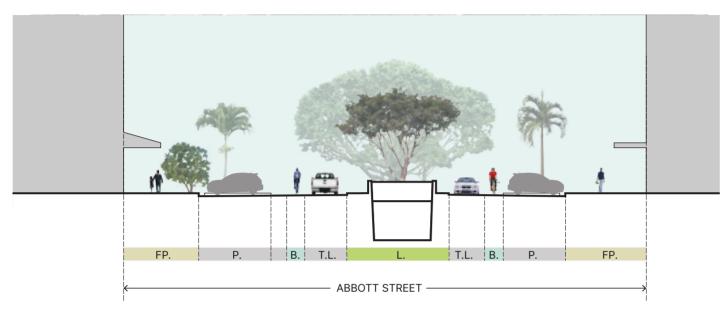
Existing Abbott Street section (between Spence Street and Wharf Street)
